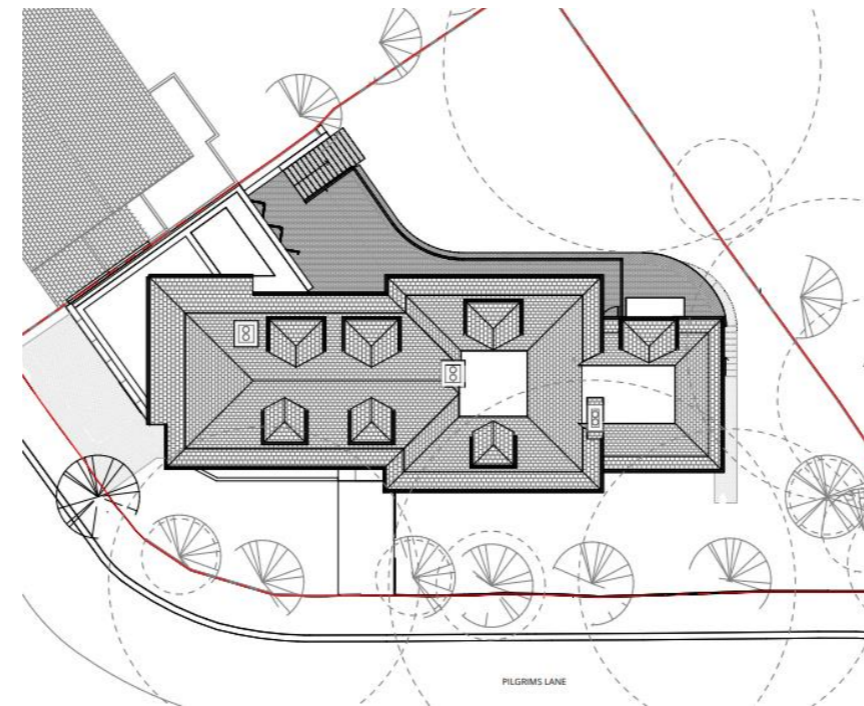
Proposed site plan with RPZs shown indicatively (Wolff Architects)
